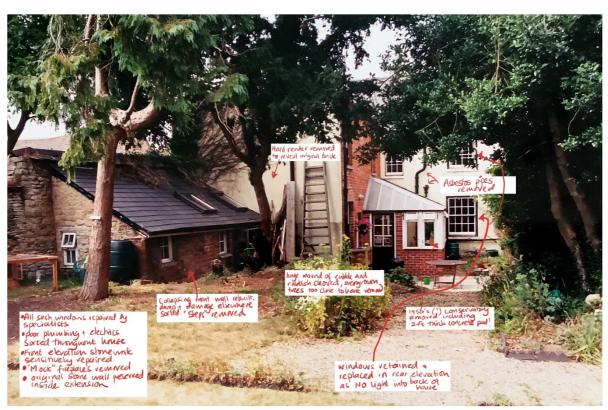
2-storey extension with service range on left and C20 house on right
